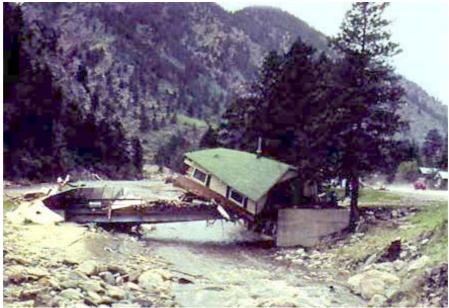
A cabin lodged on a private bridge just below Drake, Colorado (Photo by W. R. Hansen, USGS on 8/13/76).
